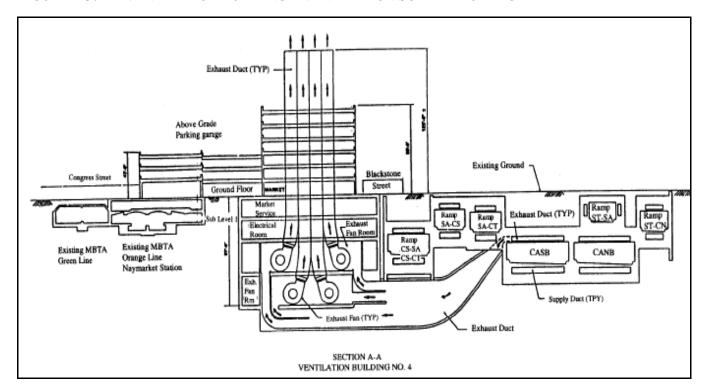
VENTILATION BUILDING 4 VENTILATION SCHEMATIC DIAGRAM
